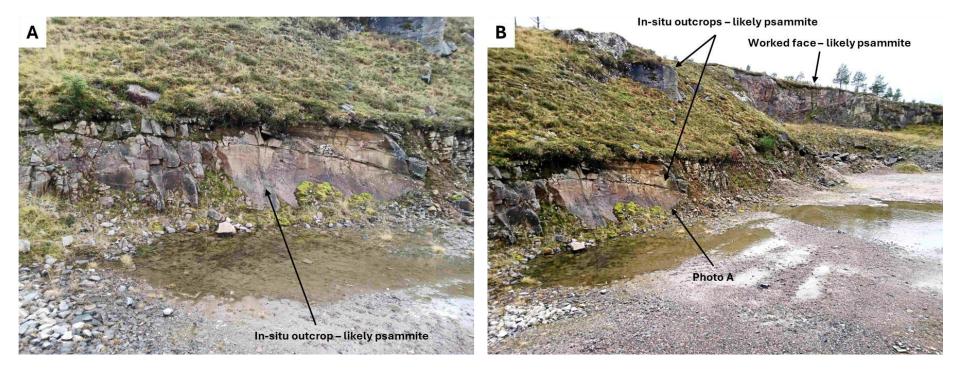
Photograph Set 2, BP02 search area, existing excavated site. Views towards the southwest.
